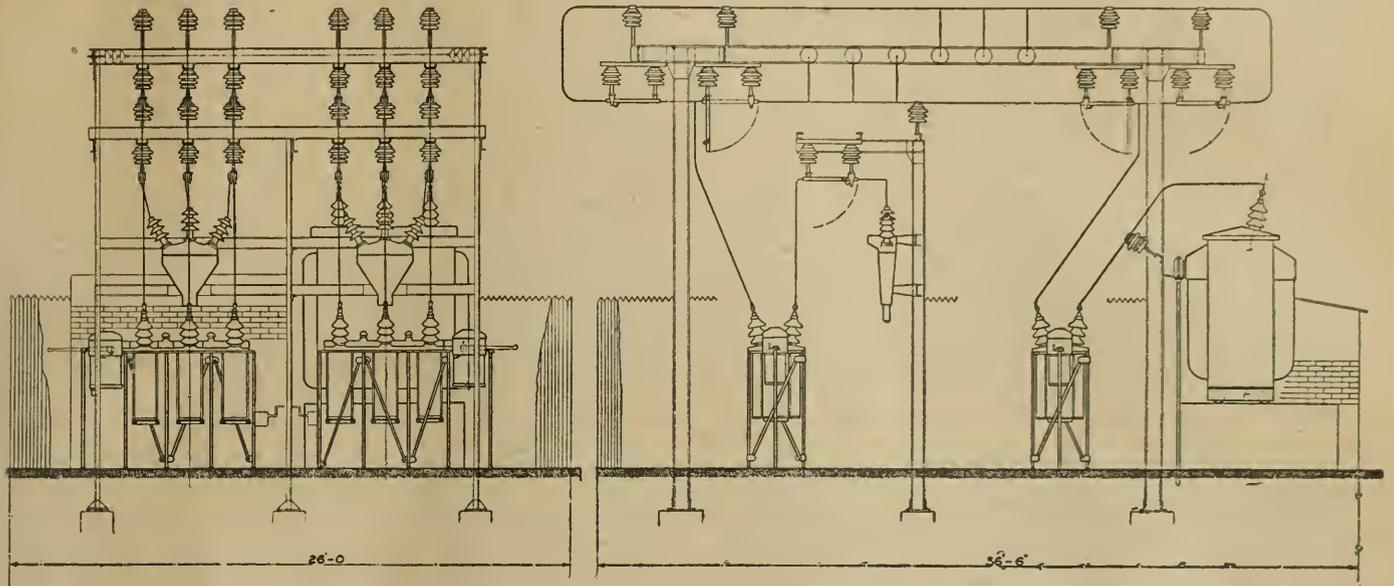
END ELEVATION AND SECTION THROUGH ONE FEEDER AND TRANSFORMER CIRCUIT.
